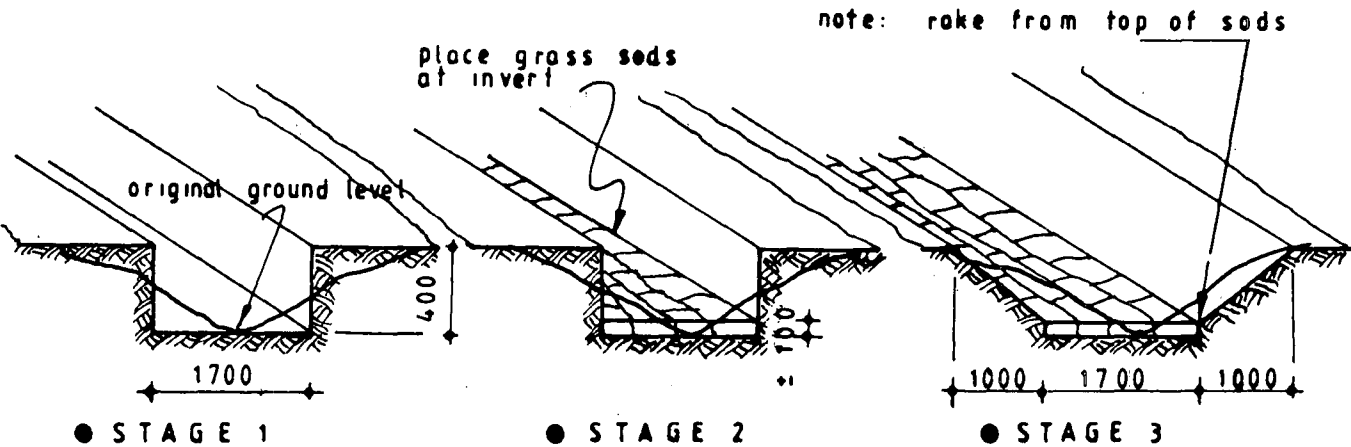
Three stages in the construction of a trapezoidal waterway
